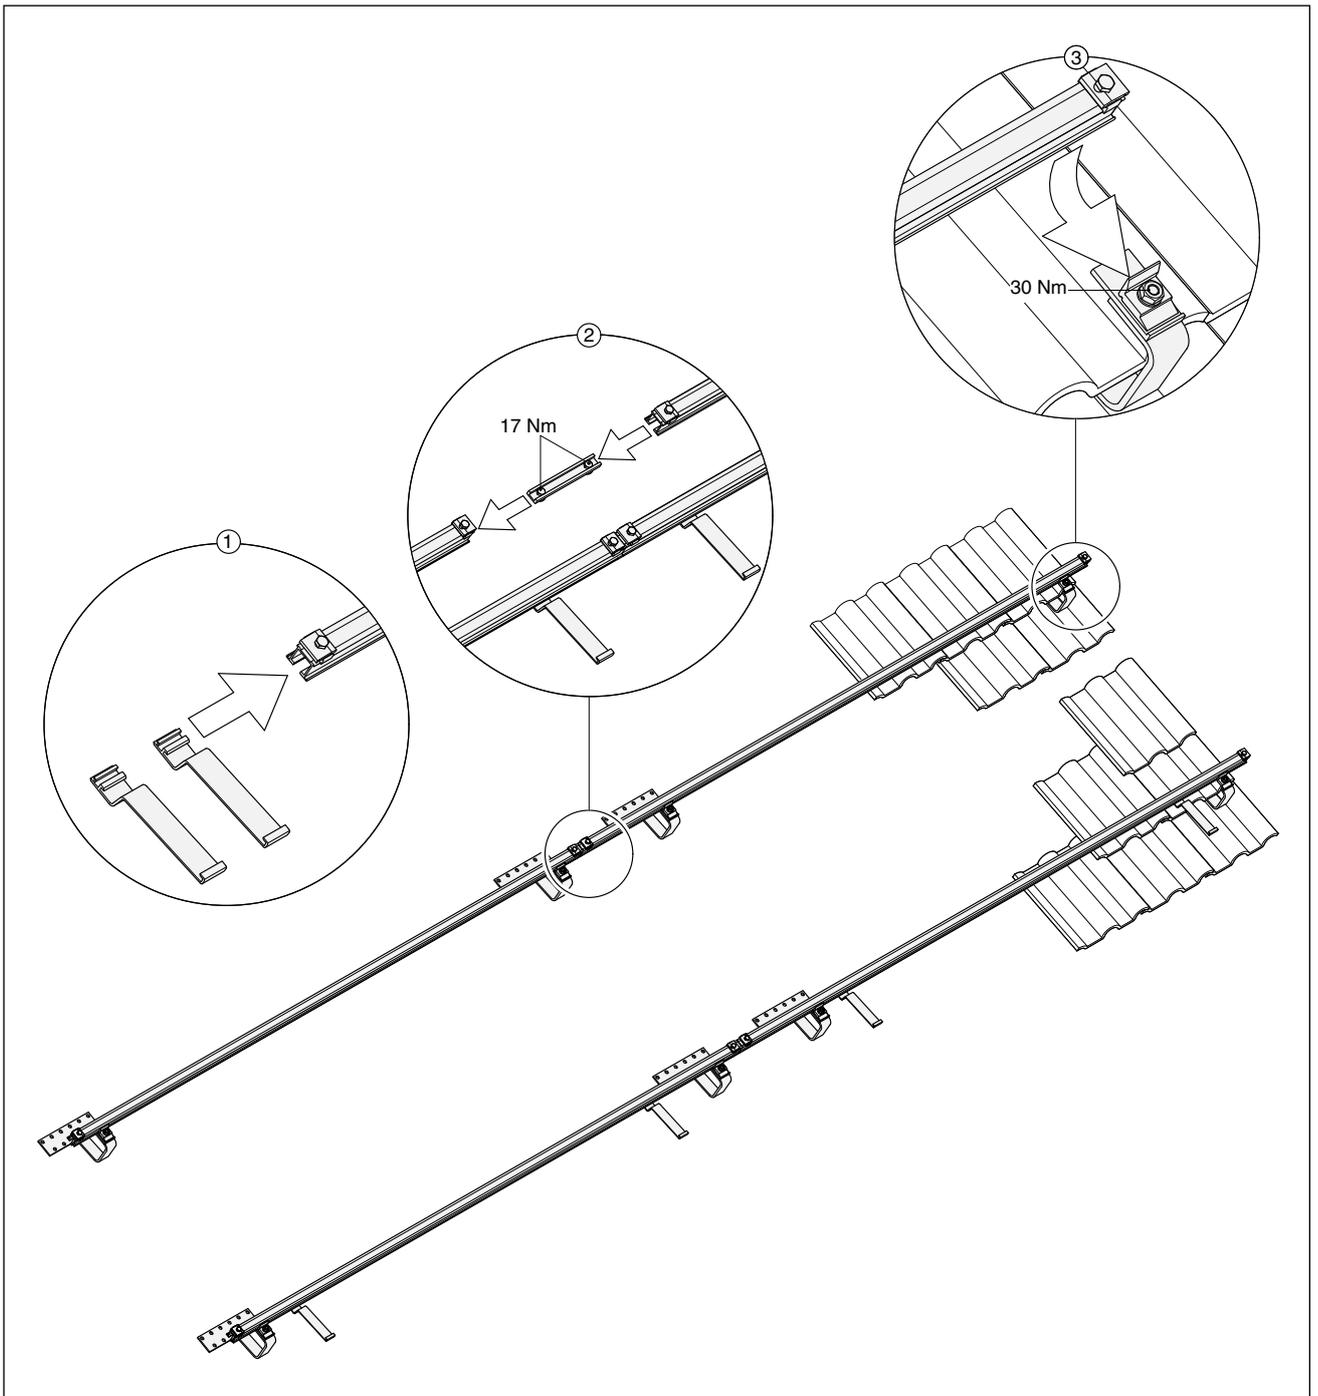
Rail installation with specification of the distance between the roof anchors with 4 roof hooks per collector (application limits see table)
